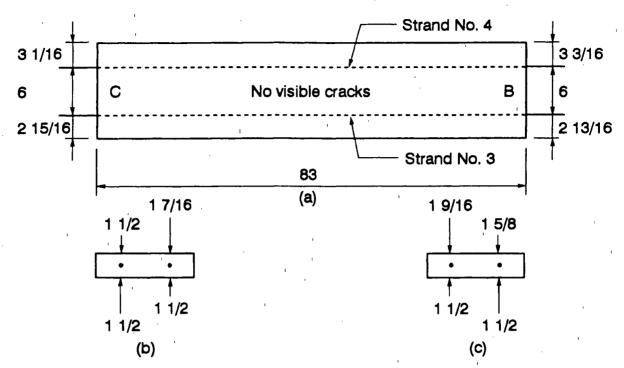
Specimen No. 3-3.0TC-5 (dimensions shown in inches):
